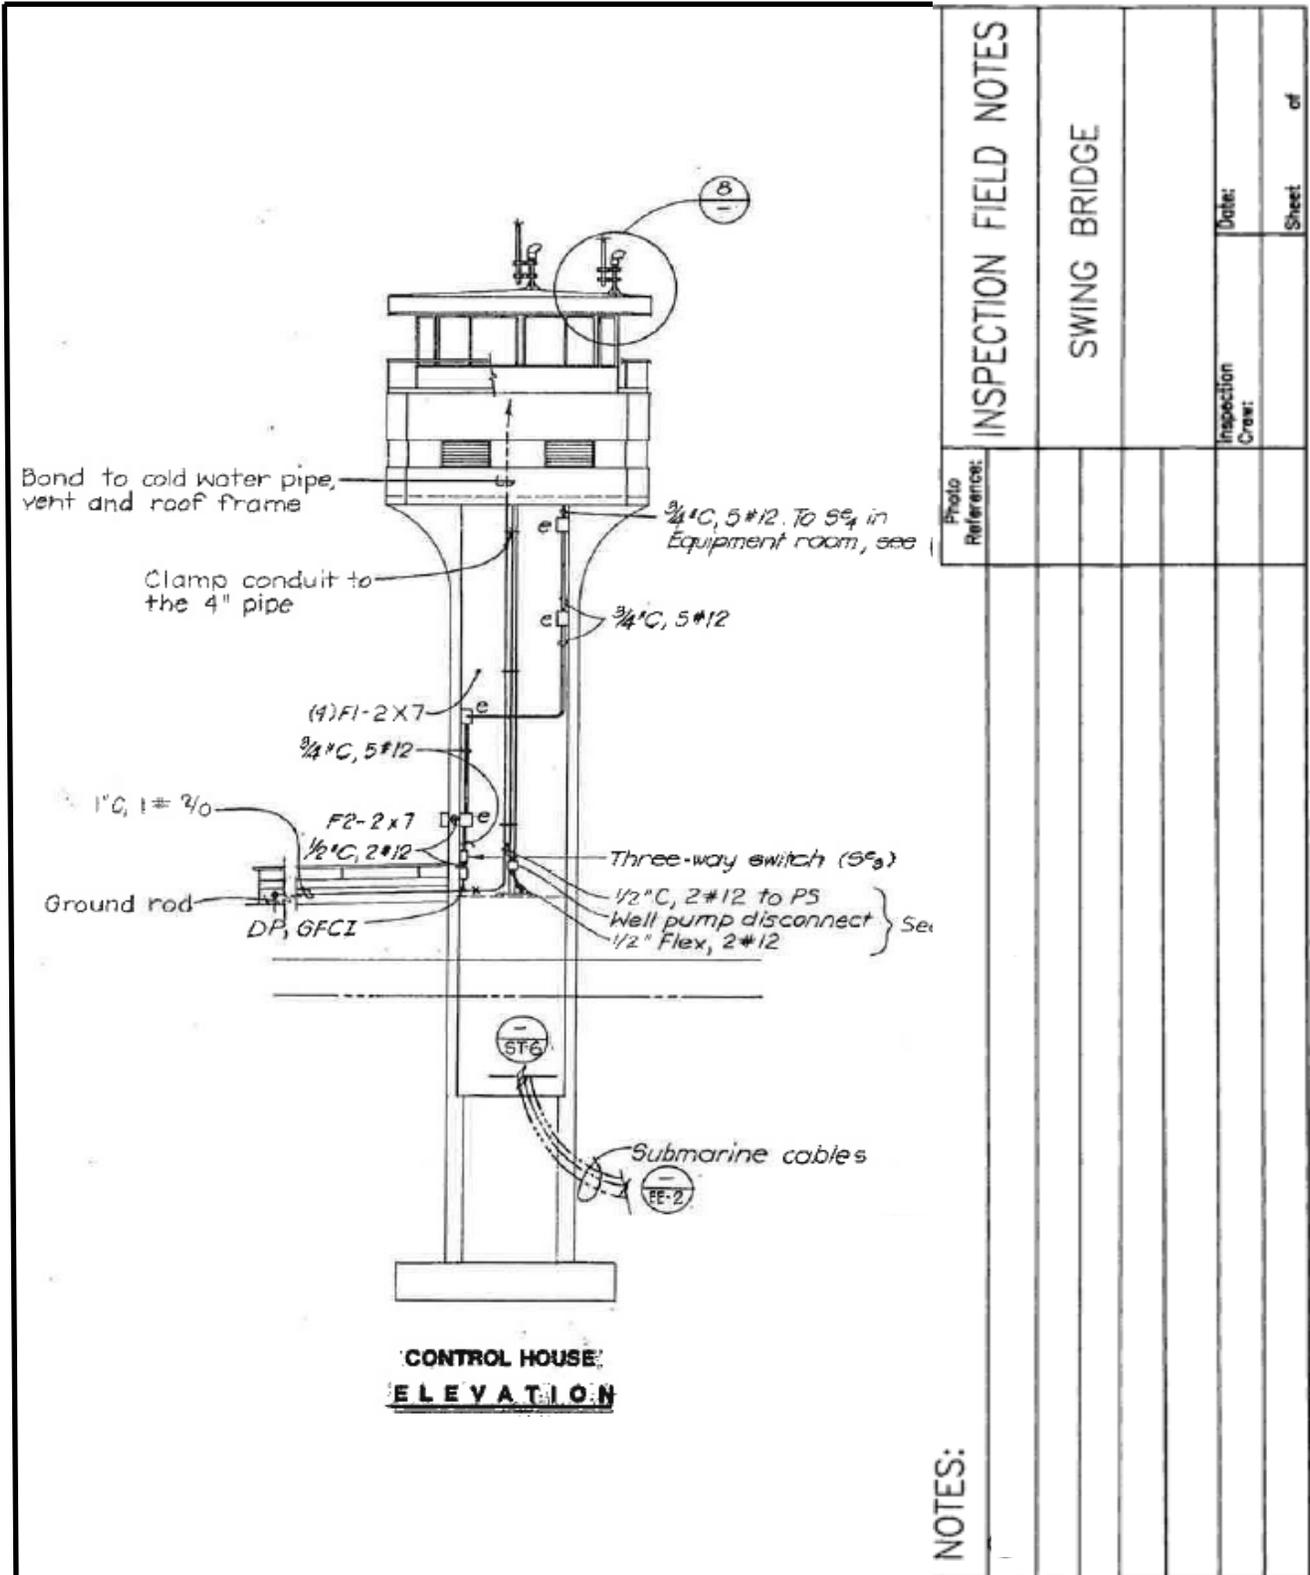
Example field notes for typical movable bridge house
